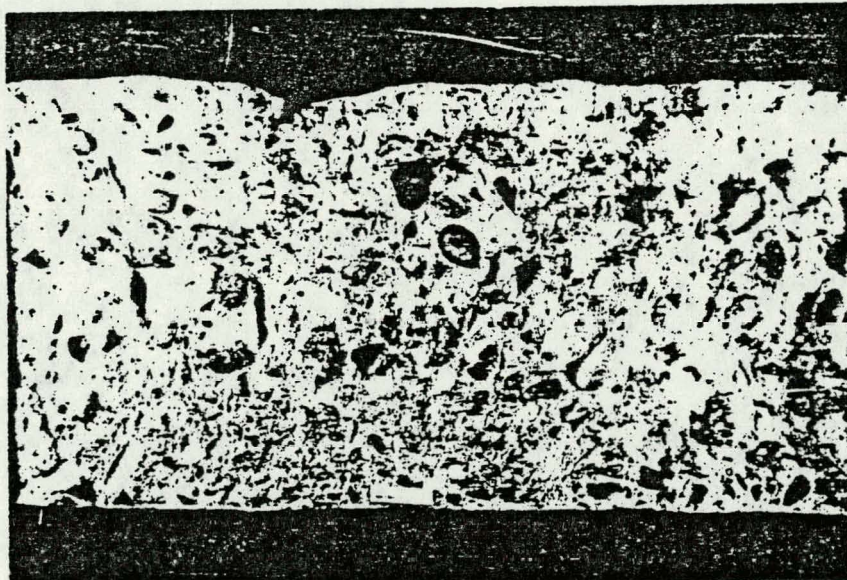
Split Tensile-Test Cylinder, 4.5K 8-29, moist-cured for 679 days. Fracture surface has relatively few pullouts and many broken aggregates, with a ranking of 3.5 on the relative scale.
